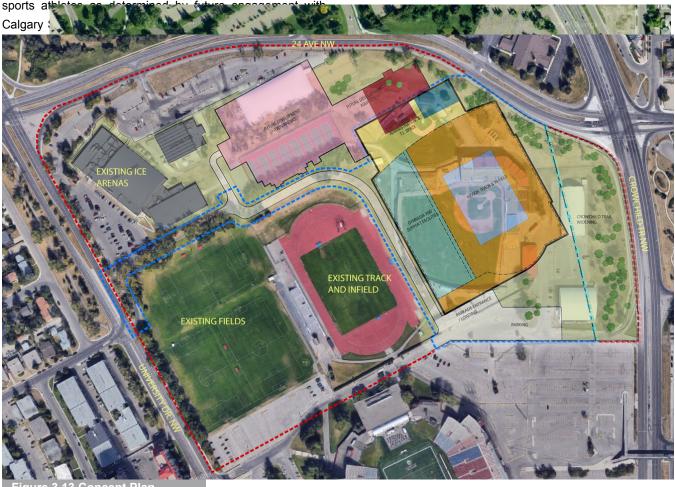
Concept Plan Overlaid on Existing Site Features
